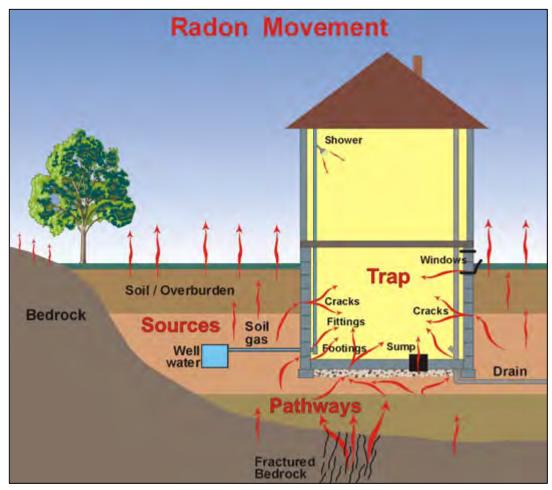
Sketch of Radon Entry Points into a House
